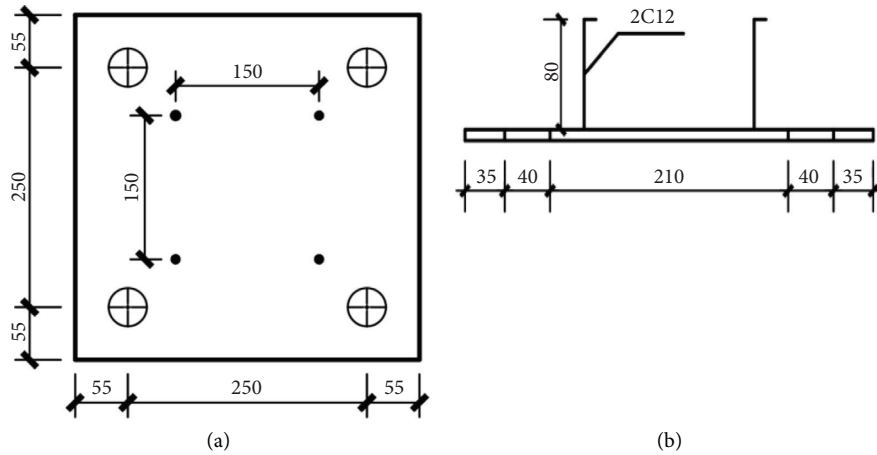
Steel plate design drawing. (a) Front view. (b) Side view.
